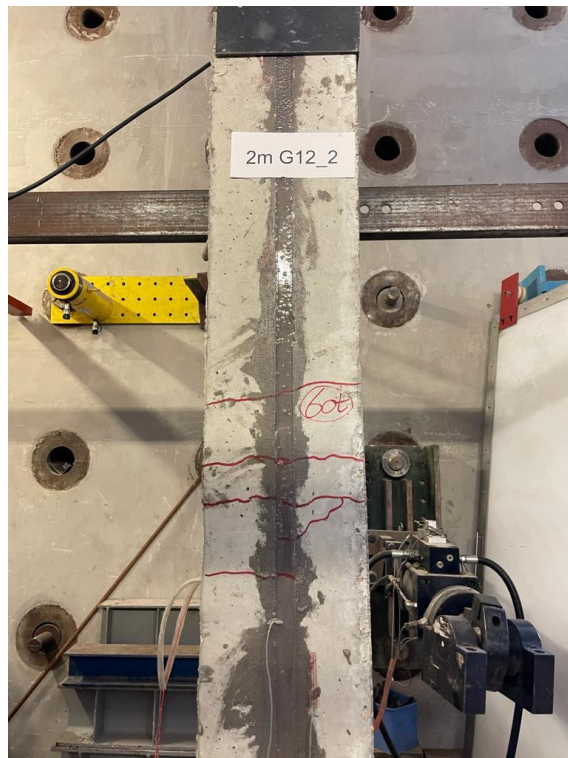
Cracks at the tension side of Column 2-C12-2
